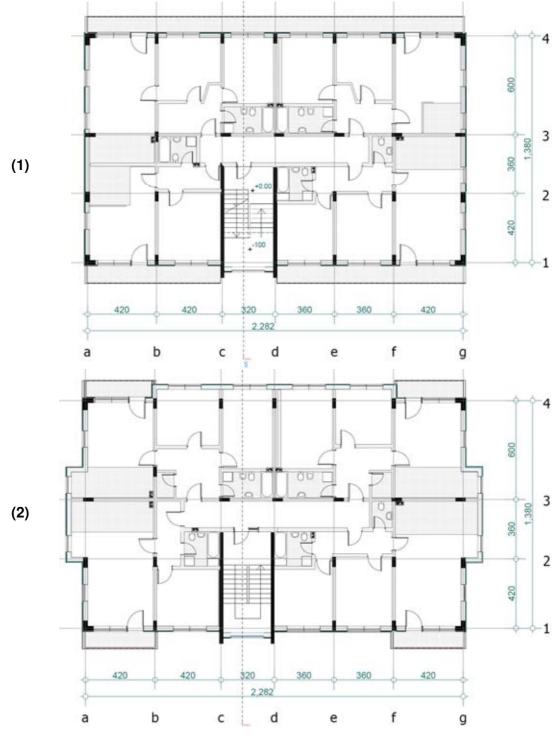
Ground floor (1) and characteristic floor (2) layout plan of Building 1
